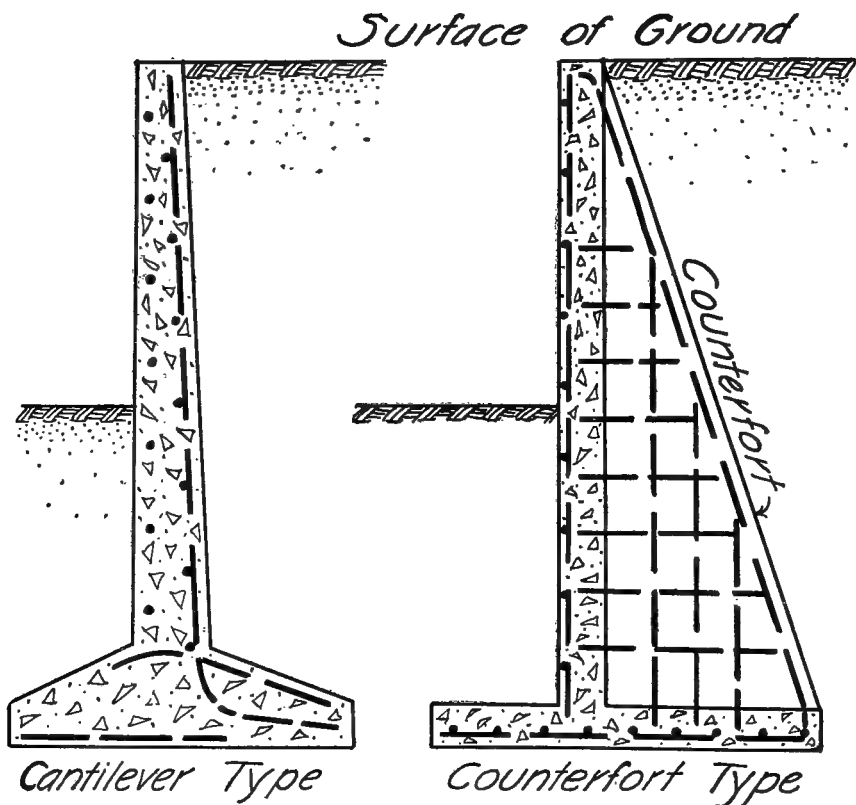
TYPES OF REINFORCED CONCRETE RETAINING WALLS
